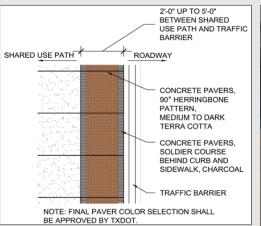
Shared Use Path Roadway Buffer, 2 Feet to 5 Feet, from Traffic Barrier
